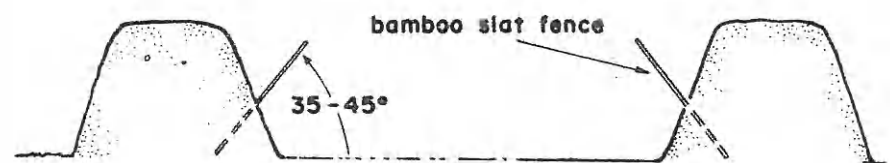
SIDE VIEW OF CRAB POND WITH EARTHEN DIKES. SHOWING DETAILS OF BAMBOO SLATS.
